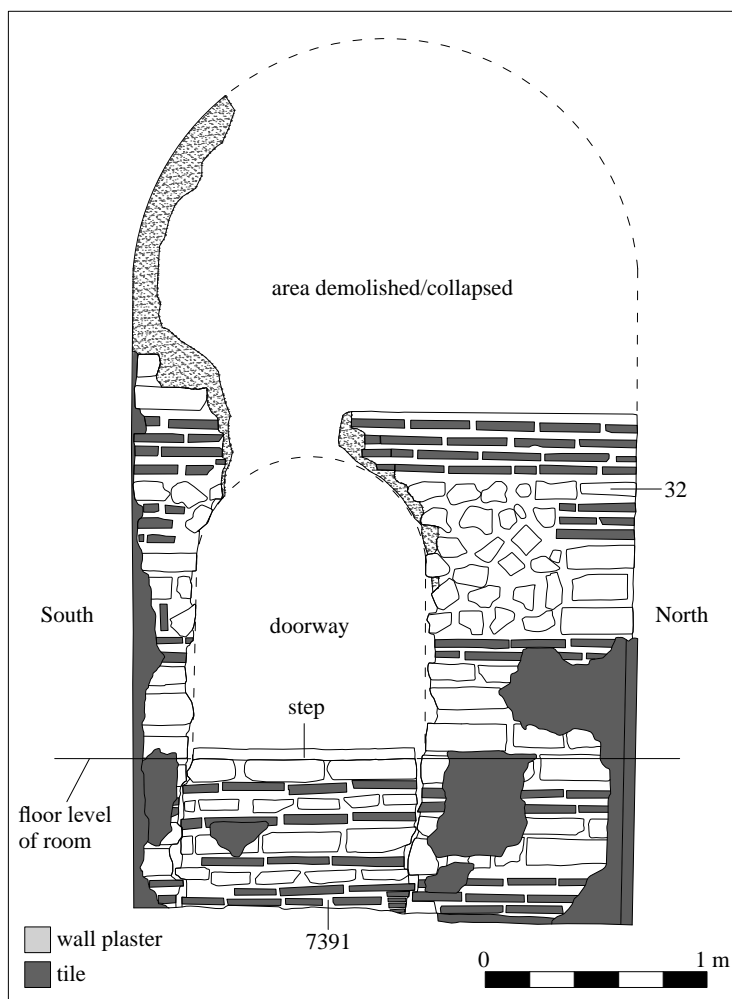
The east-facing elevation of wall 32 showing the position of the main doorway into the cistern bath-house cut through blocking wall 7391
